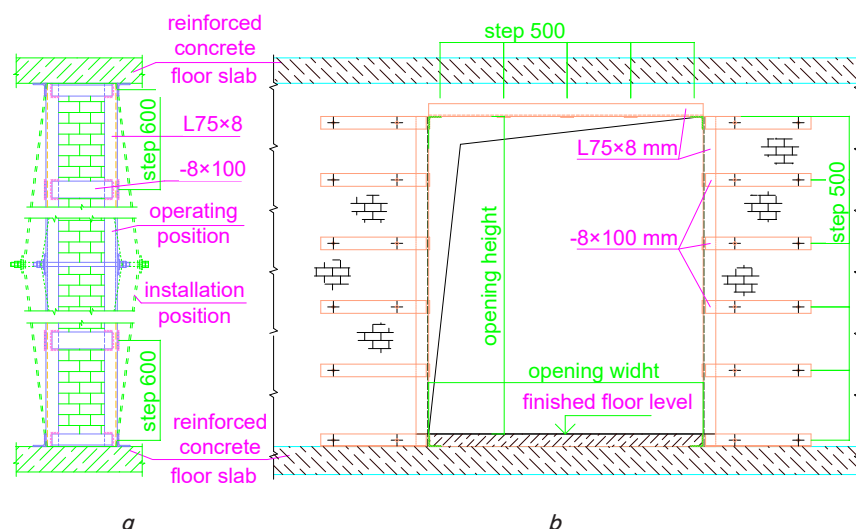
General view of solutions for strengthening damaged elements: *a* – brick columns; *b* – brick structures along the perimeter of openings
